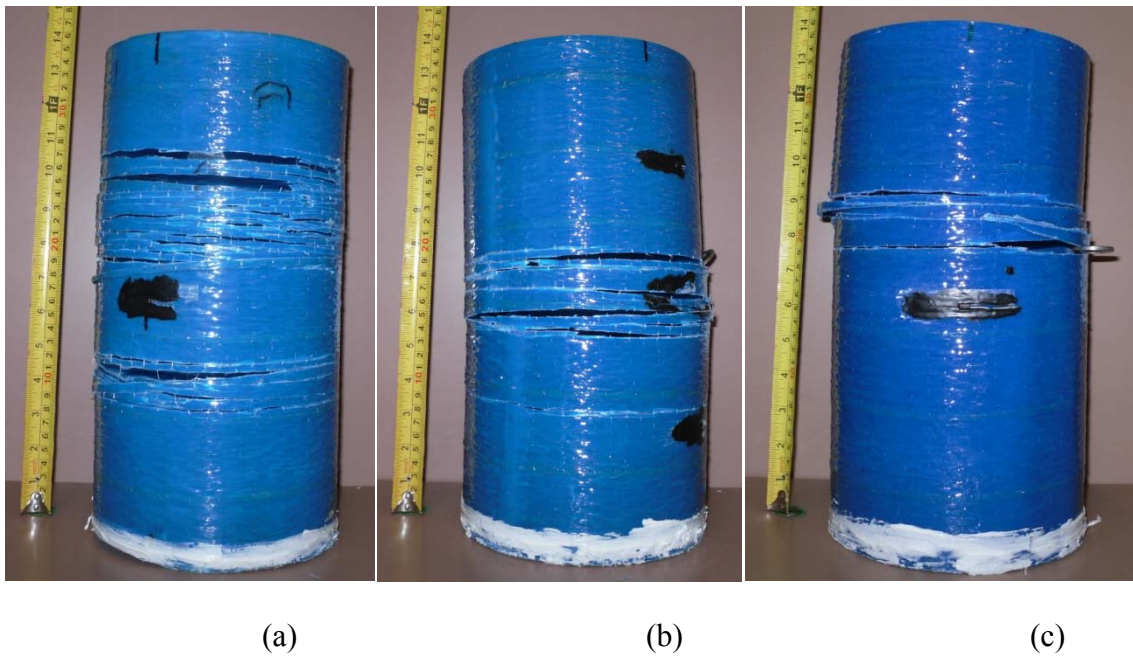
Failure mode of 171 mm diameter GFRP cylindrical specimens
